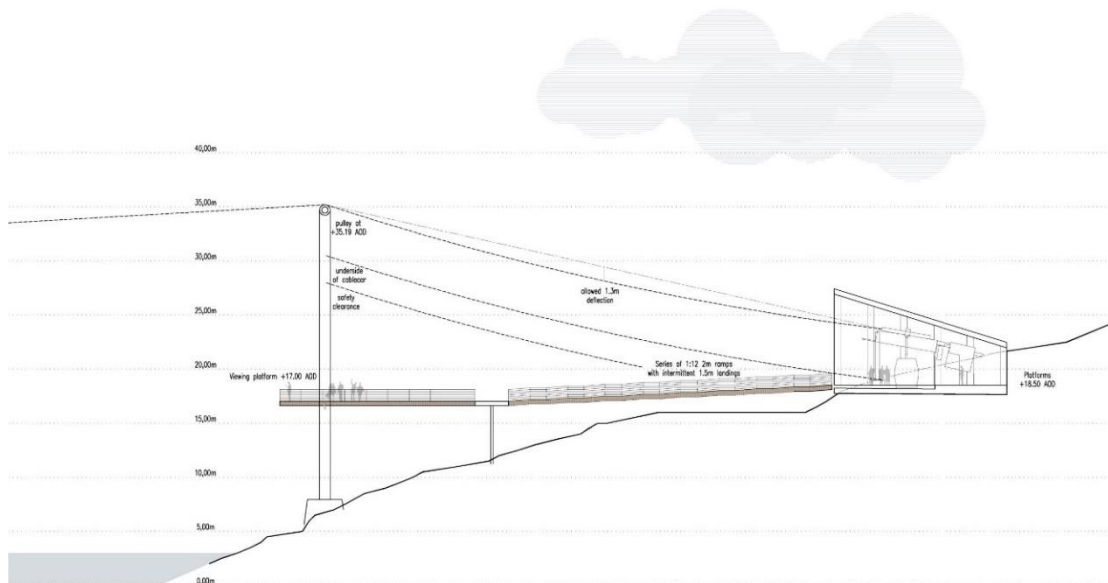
Option 3a architectural section showing ramped access to station platforms
